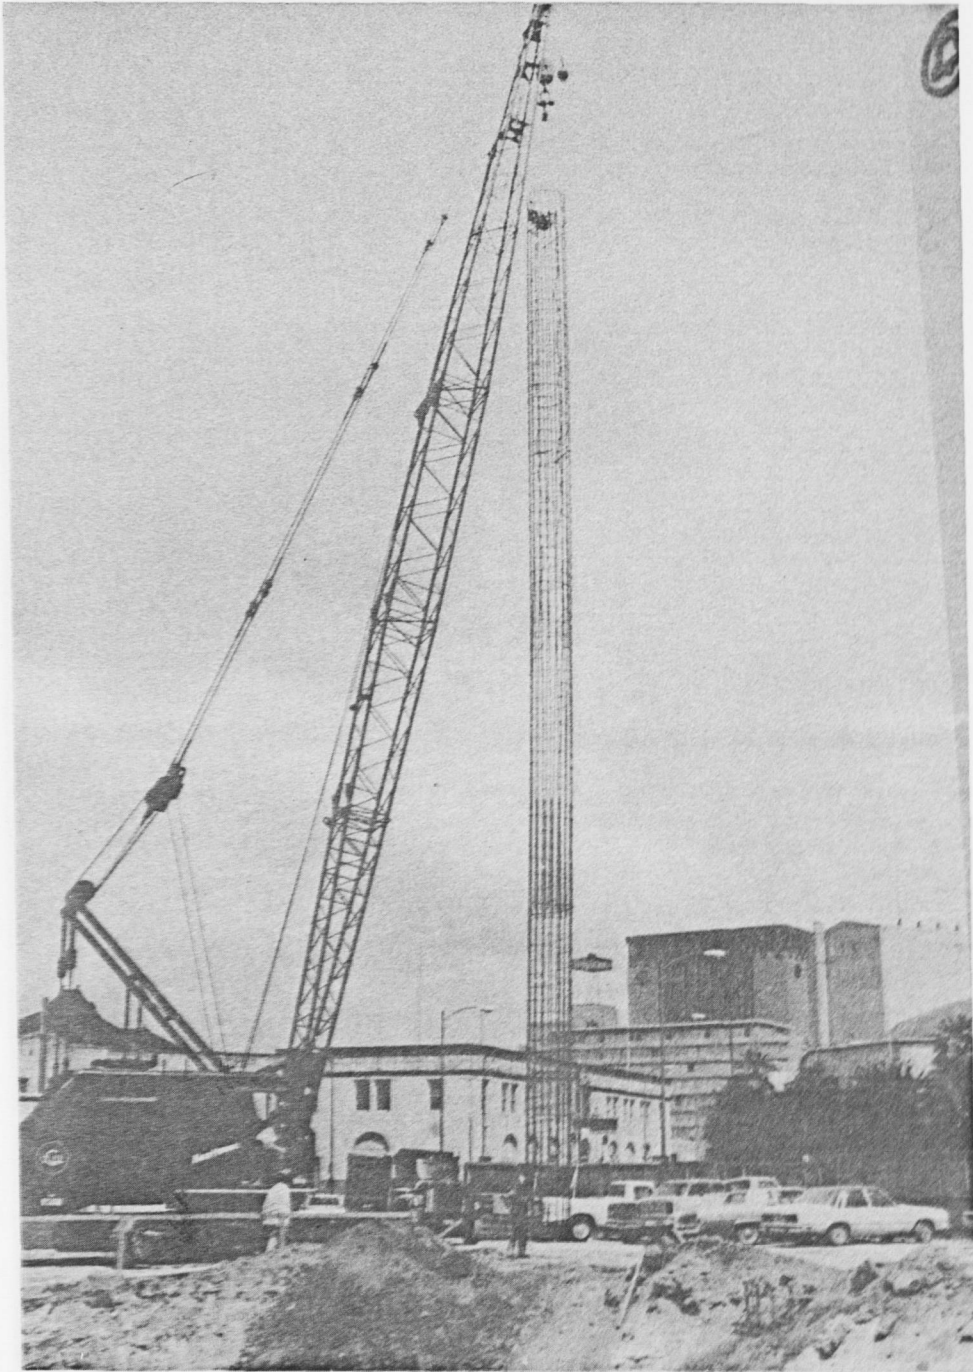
INSTRUMENTED REINFORCING CAGE READY FOR LOWERING INTO PIER EXCAVATION
